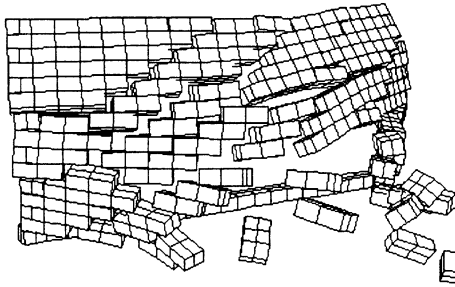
Failure of a Masonry Wall Due to a Blast Load.
